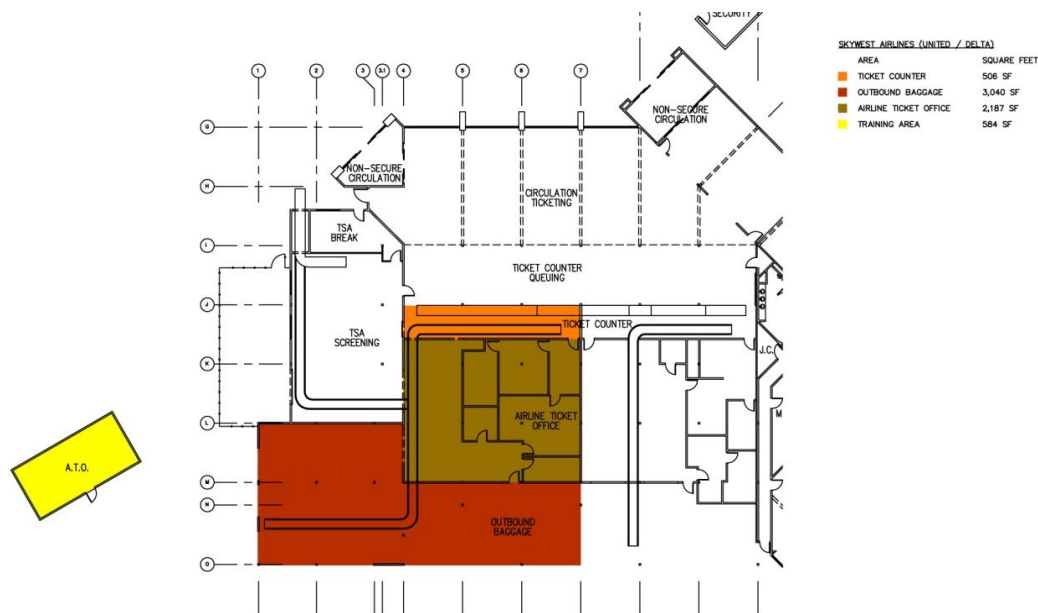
AREA "A" TERMINAL FLOOR PLAN
